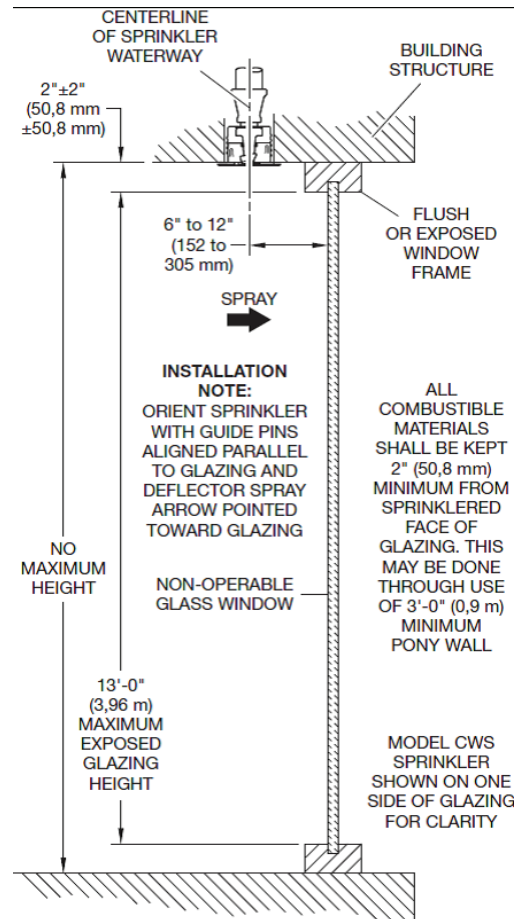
Installation requirements for Tyco Model CWS Concealed Window Sprinkler
